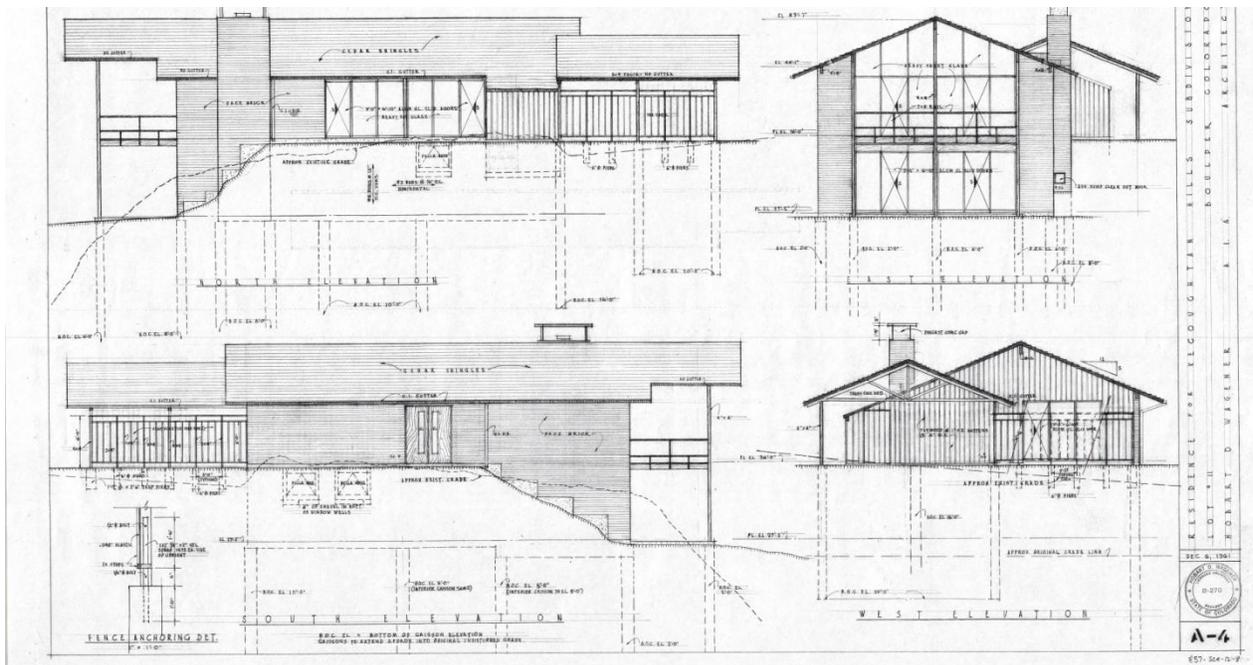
Original drawings showing house designed for Lot 11, Kecoughtan Hills Subdivision, 1961.
